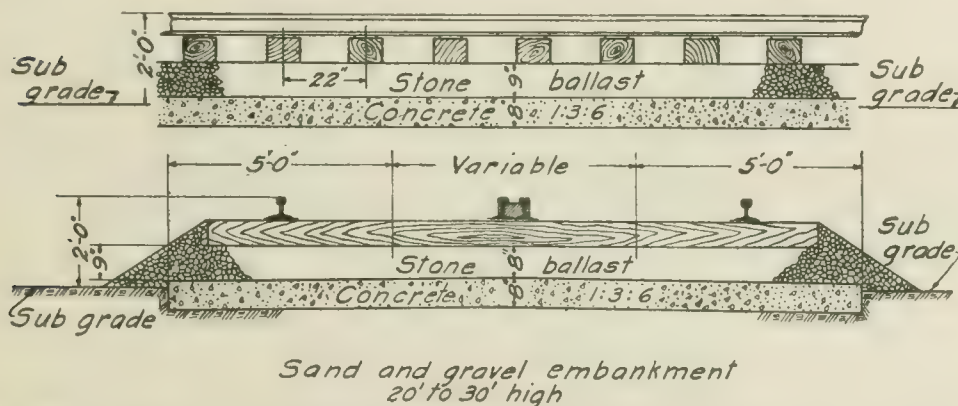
SECTION OF CONCRETE SLAB, JAMAICA IMPROVEMENT, LONG ISLAND R. R., BUILT 1912-1913.
